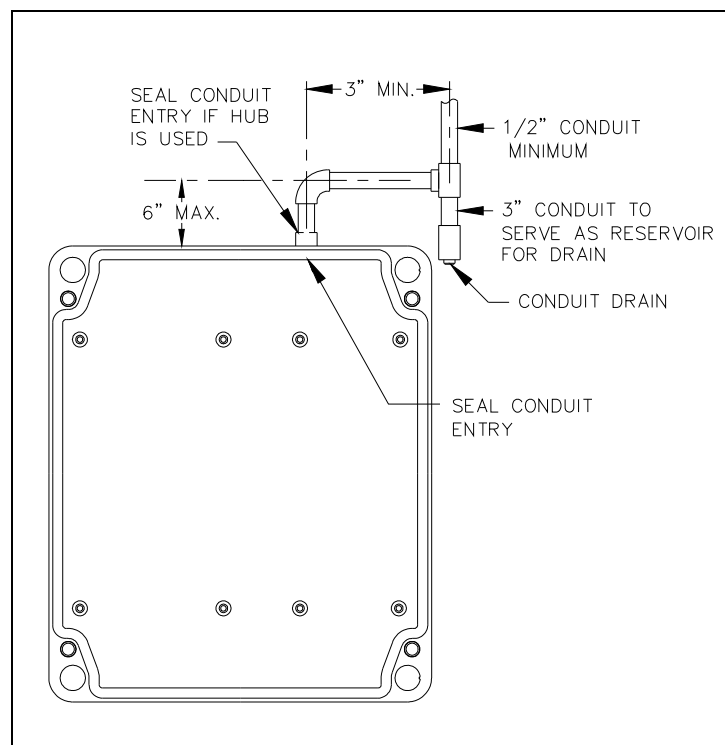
Top entry conduit installation details (NOT RECOMMENDED)
